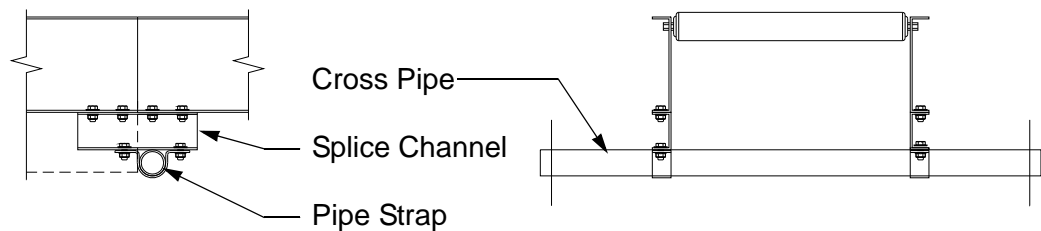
CH3-A & CH3-B Ceiling Hangers
